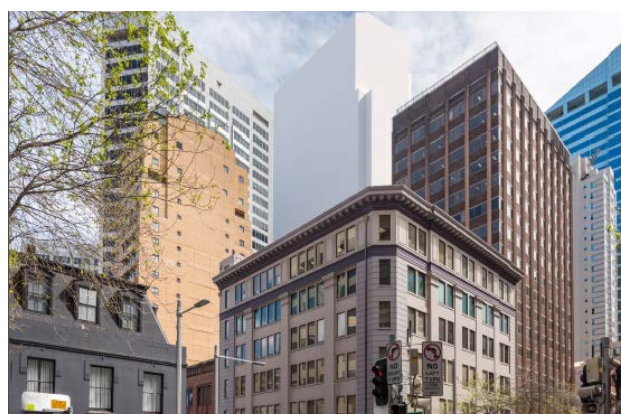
Concept Envelope and building mass currently envisaged (Corner of Kent Street and Druiitt Street)
